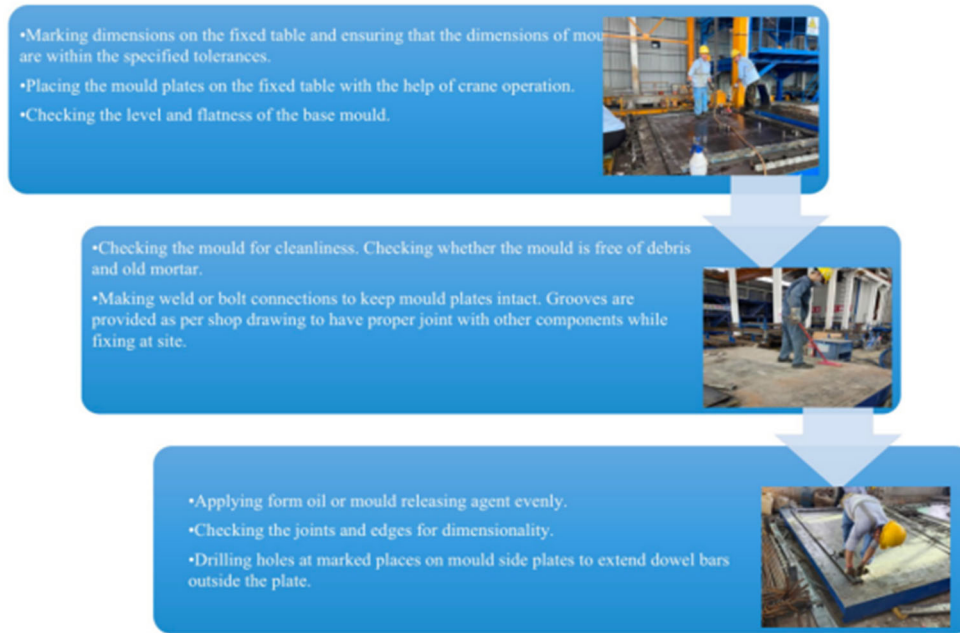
Mould assembly and preparation of a prefabricated RC slab.
